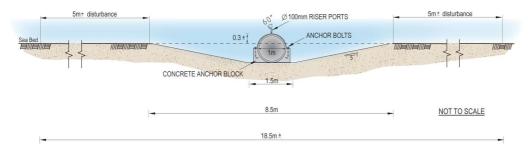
Generalised installation cross-section for the intake and discharge pipelines.
